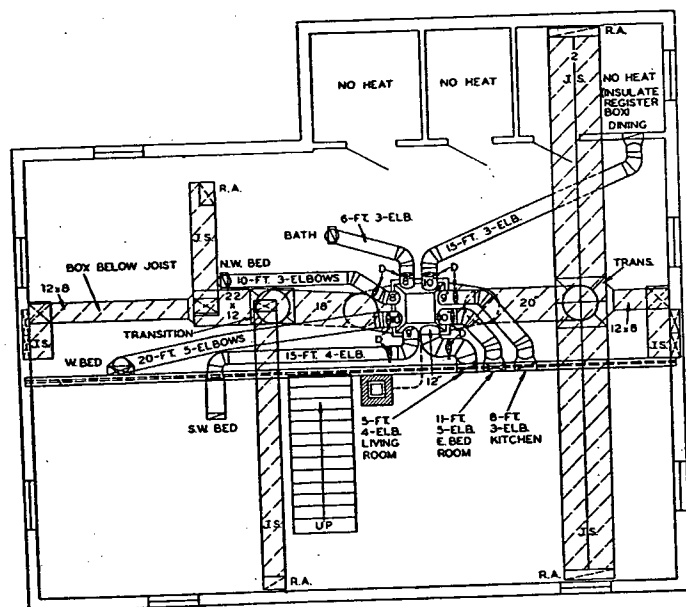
TYPICAL BASEMENT LINE DRAWING
